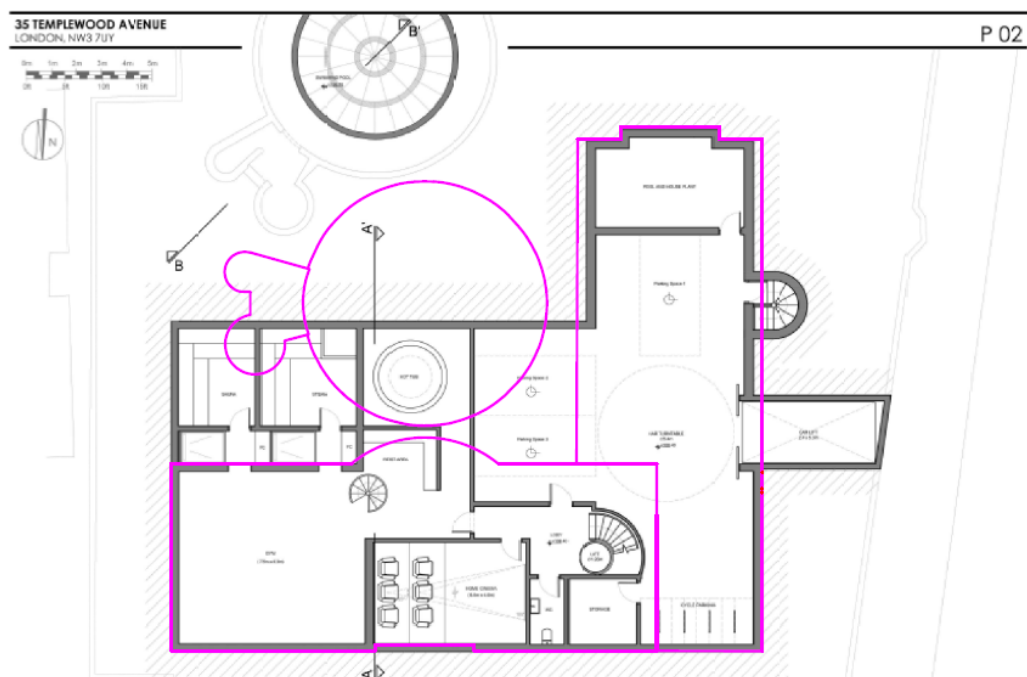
Proposed basement plan with existing layout marked in magenta.
